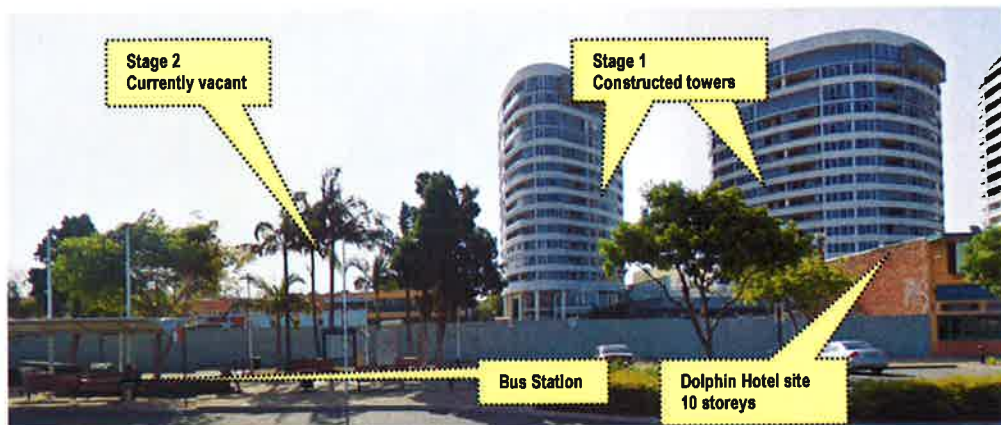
Site looking west from Wharf Street with Stage 1 in the background (Source: Google).
